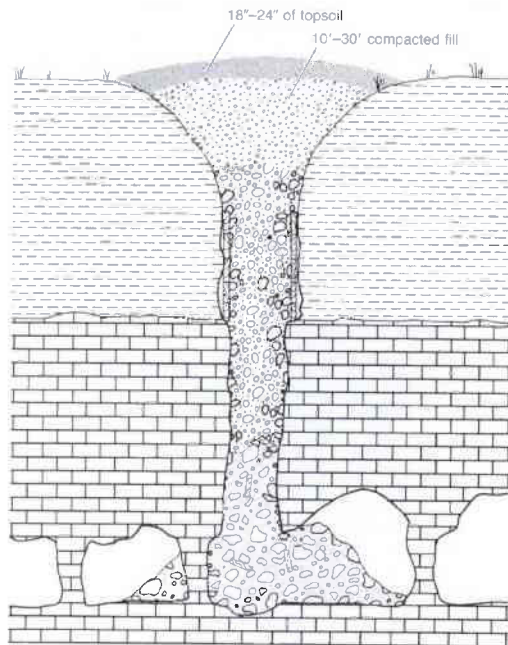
Schematic cross section of shaft site illustrating one way to seal or close the site in early stage of shaft failure.
